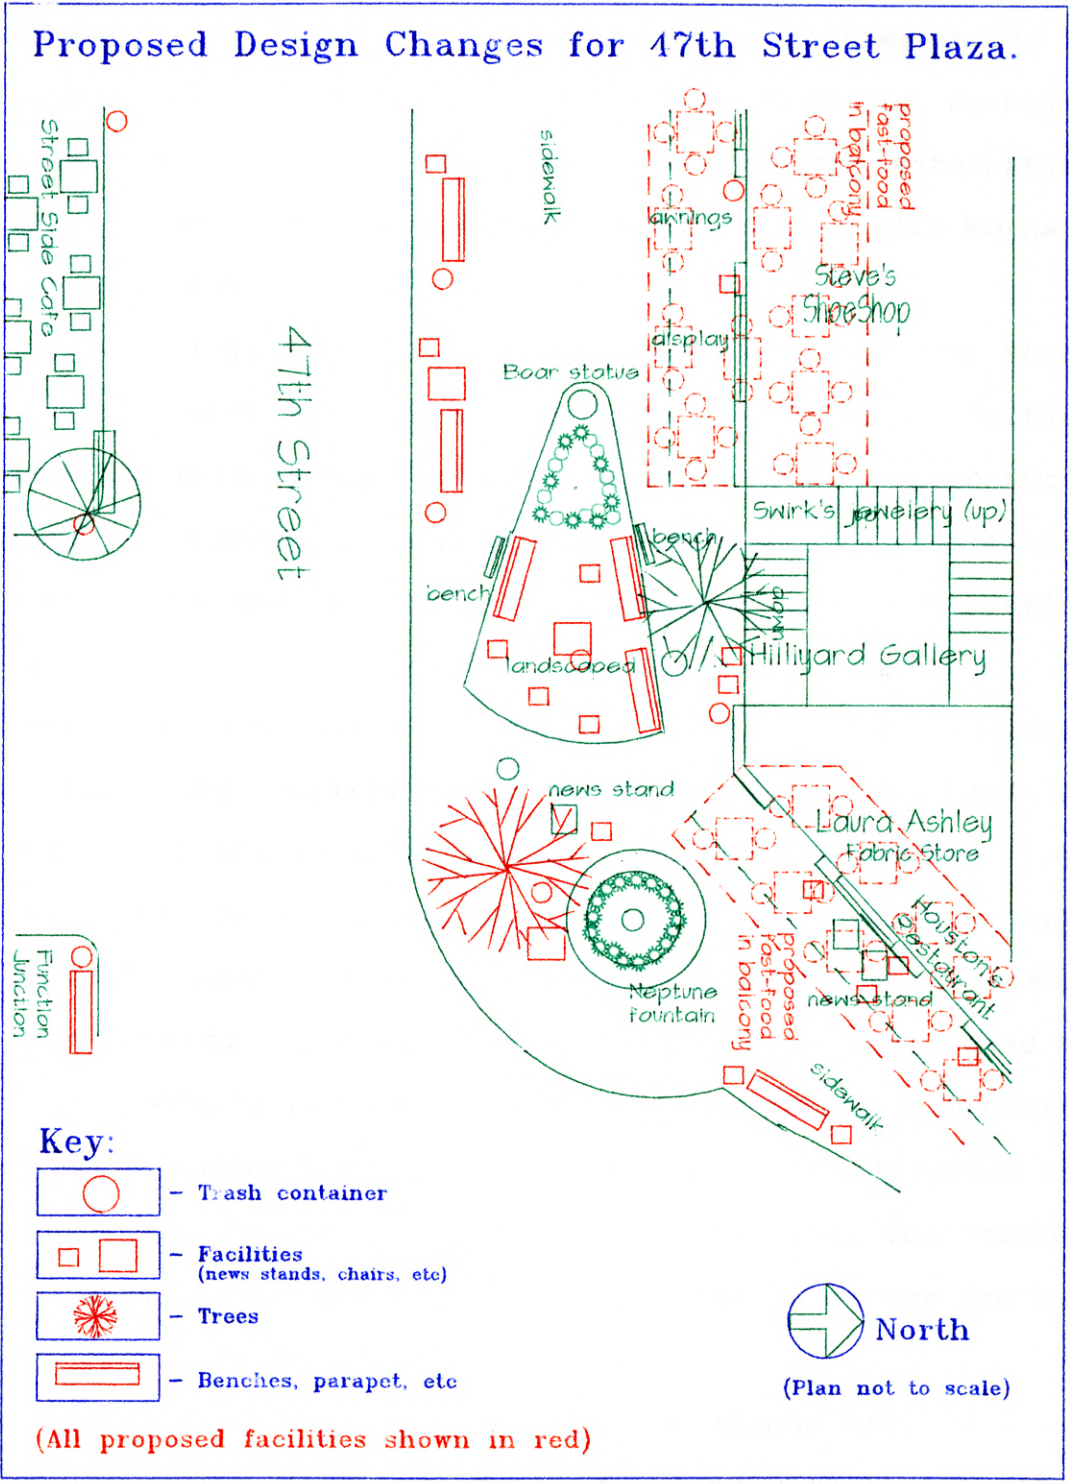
Proposed design recommendations for 47th Street Plaza.
